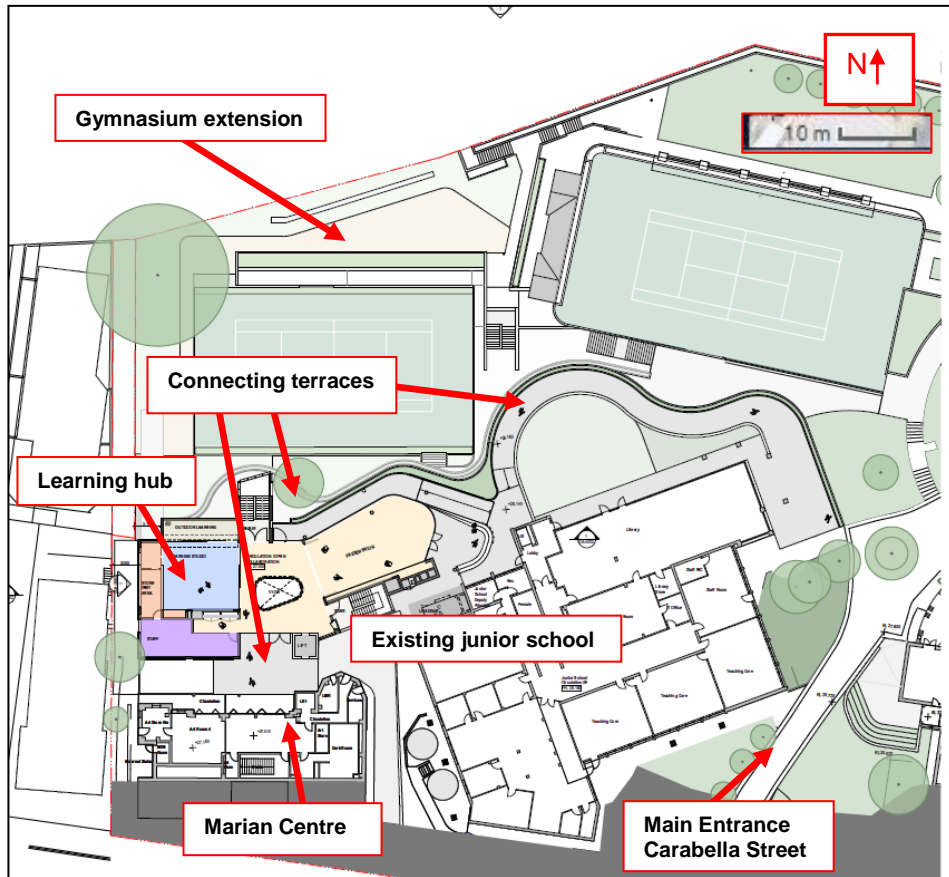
Proposed Ground Floor plan (Source: Applicant's EIS)
